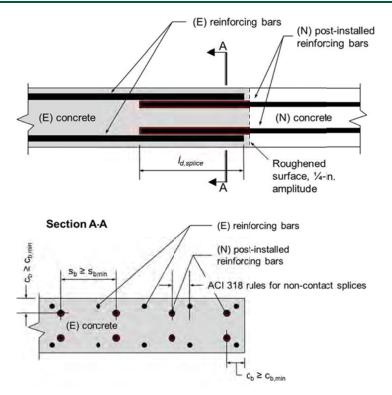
INSTALLATION PARAMATERS FOR POST-INSTALLED REINFORCING BARS
